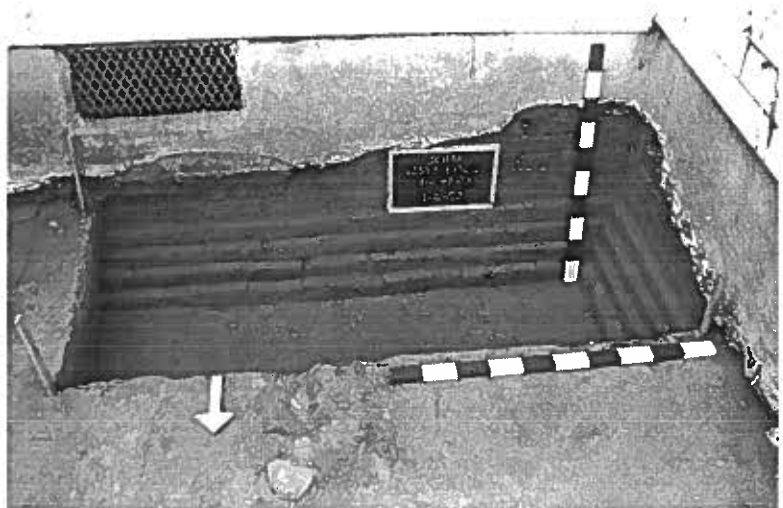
Foundation test unit at juncture of east kitchen wall and north commissary wall. Note corbeled footer. (AAS Neg. No. 2002 5333)
